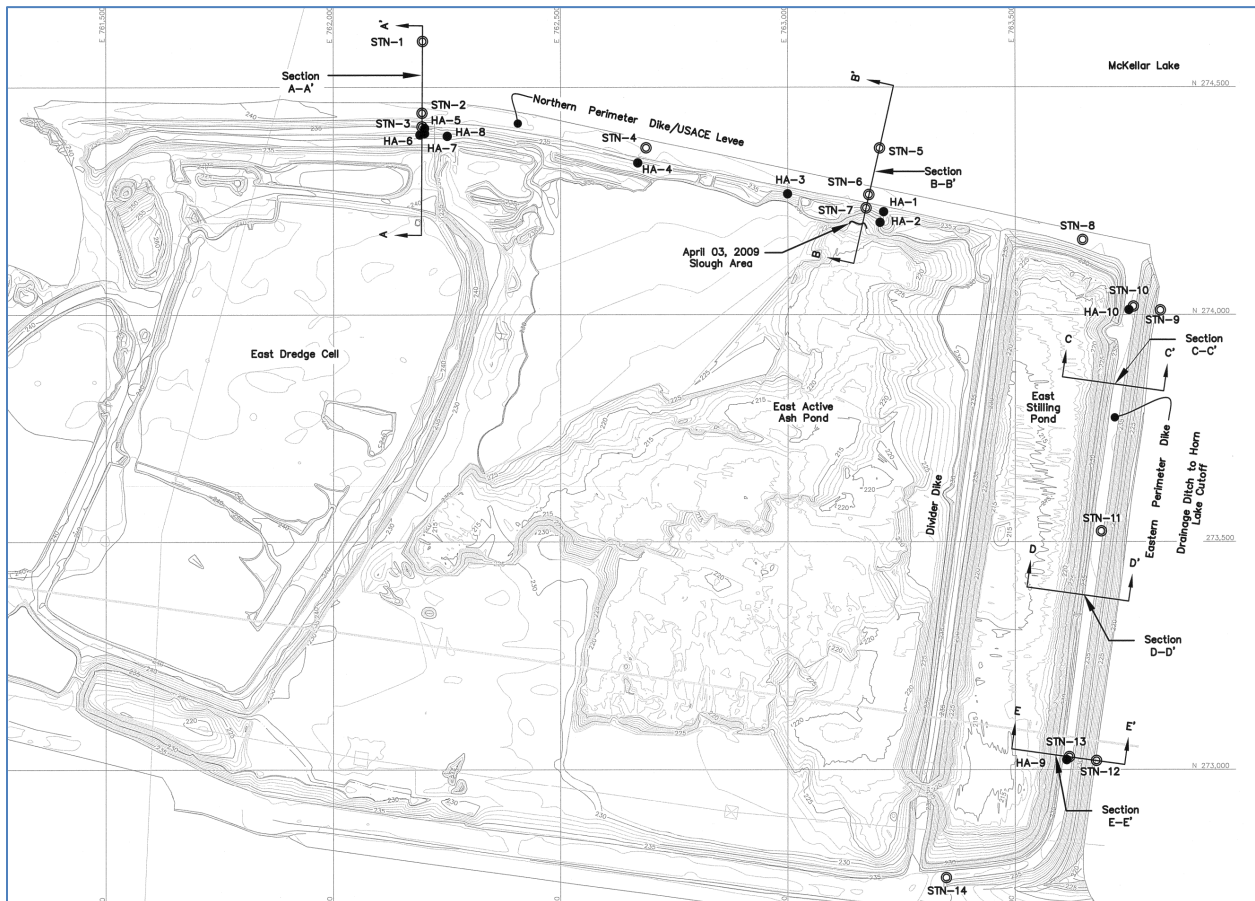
ALF East Ash Disposal Area – Plan View of Cross Sections
